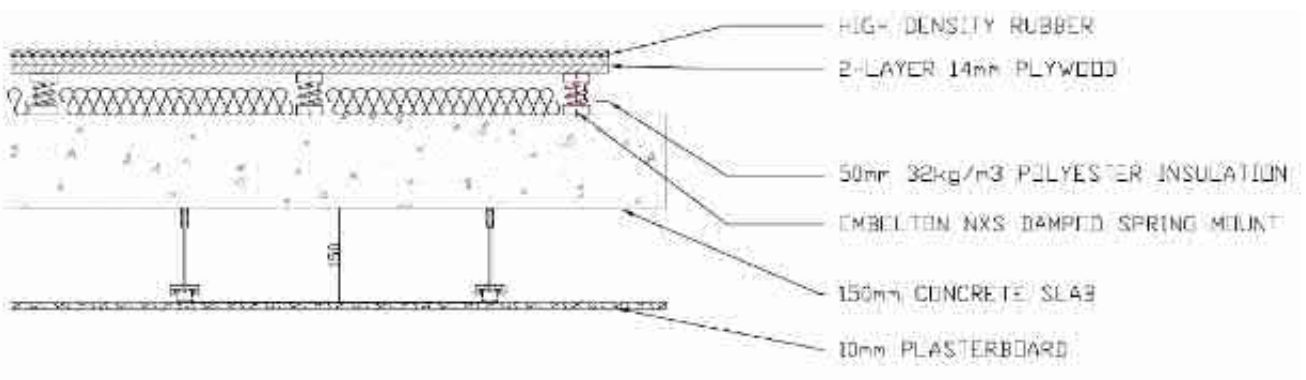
Damped springs with 2-layers, 14mm plywood and top surface rubber build-up
